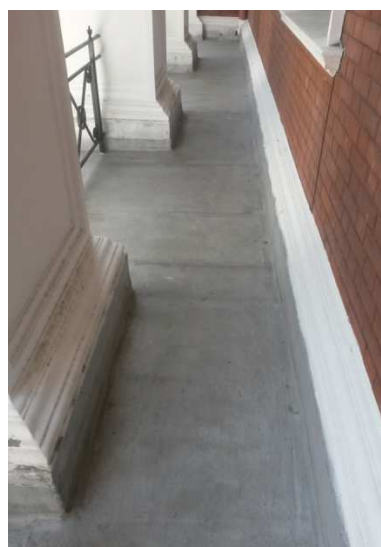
Balcony over basement archive next to Government Avenue
